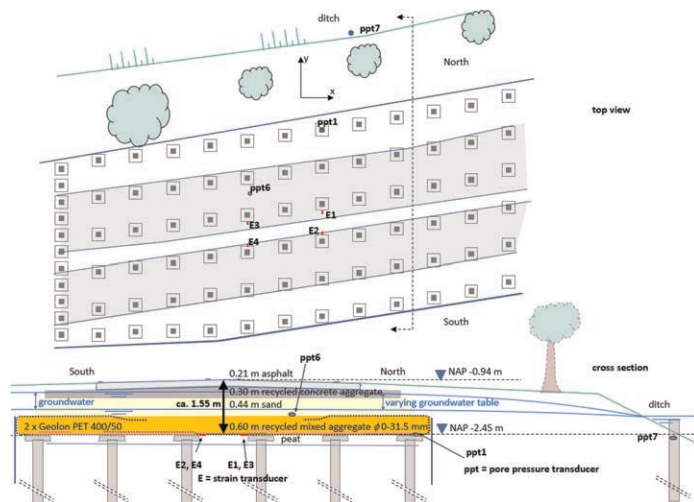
Lay-out of the geotextile-reinforced piled embankment and the monitoring equipment.
